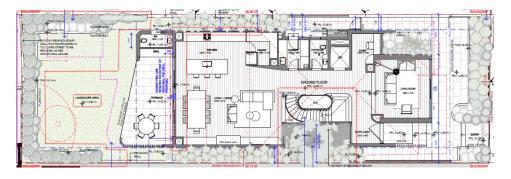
Proposed dwelling ground floor plan - 8 Victory Street, Clovelly (Source: BJB Architects Pty Ltd)
